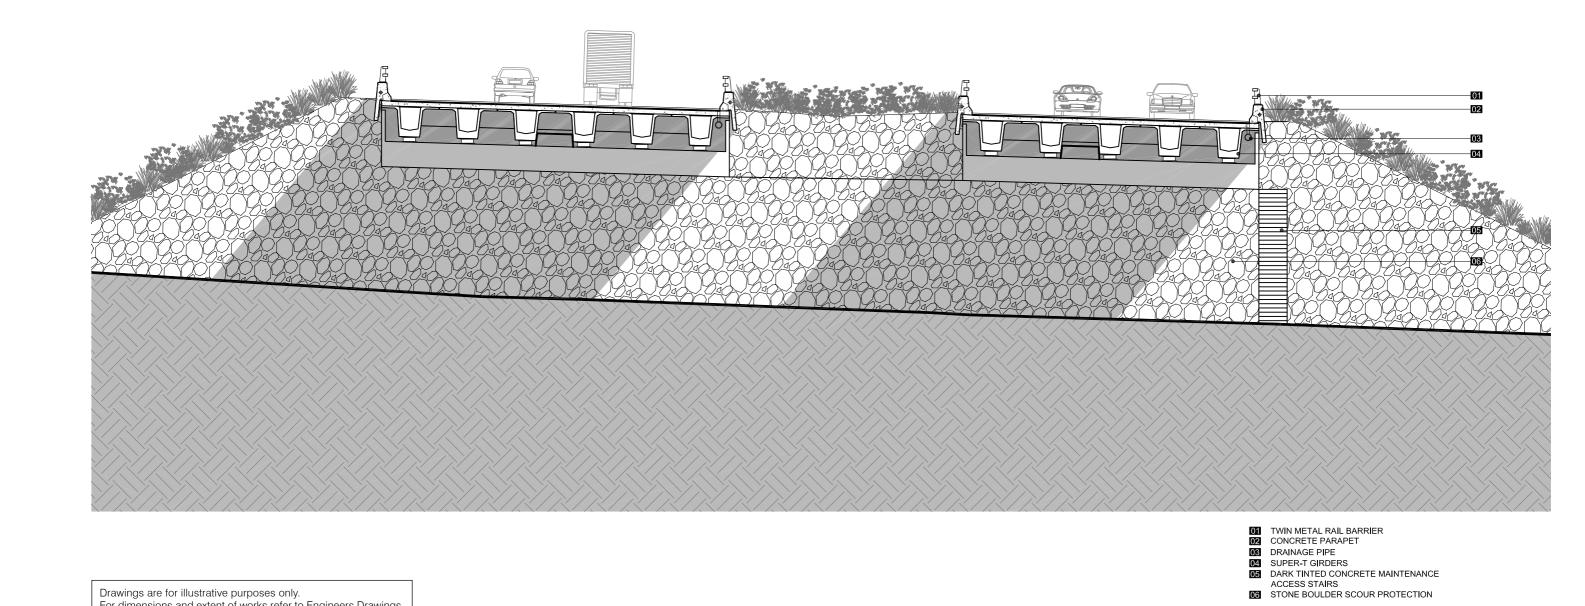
Twin bridges over Fauna Crossing: Cross Sectional Elevation
